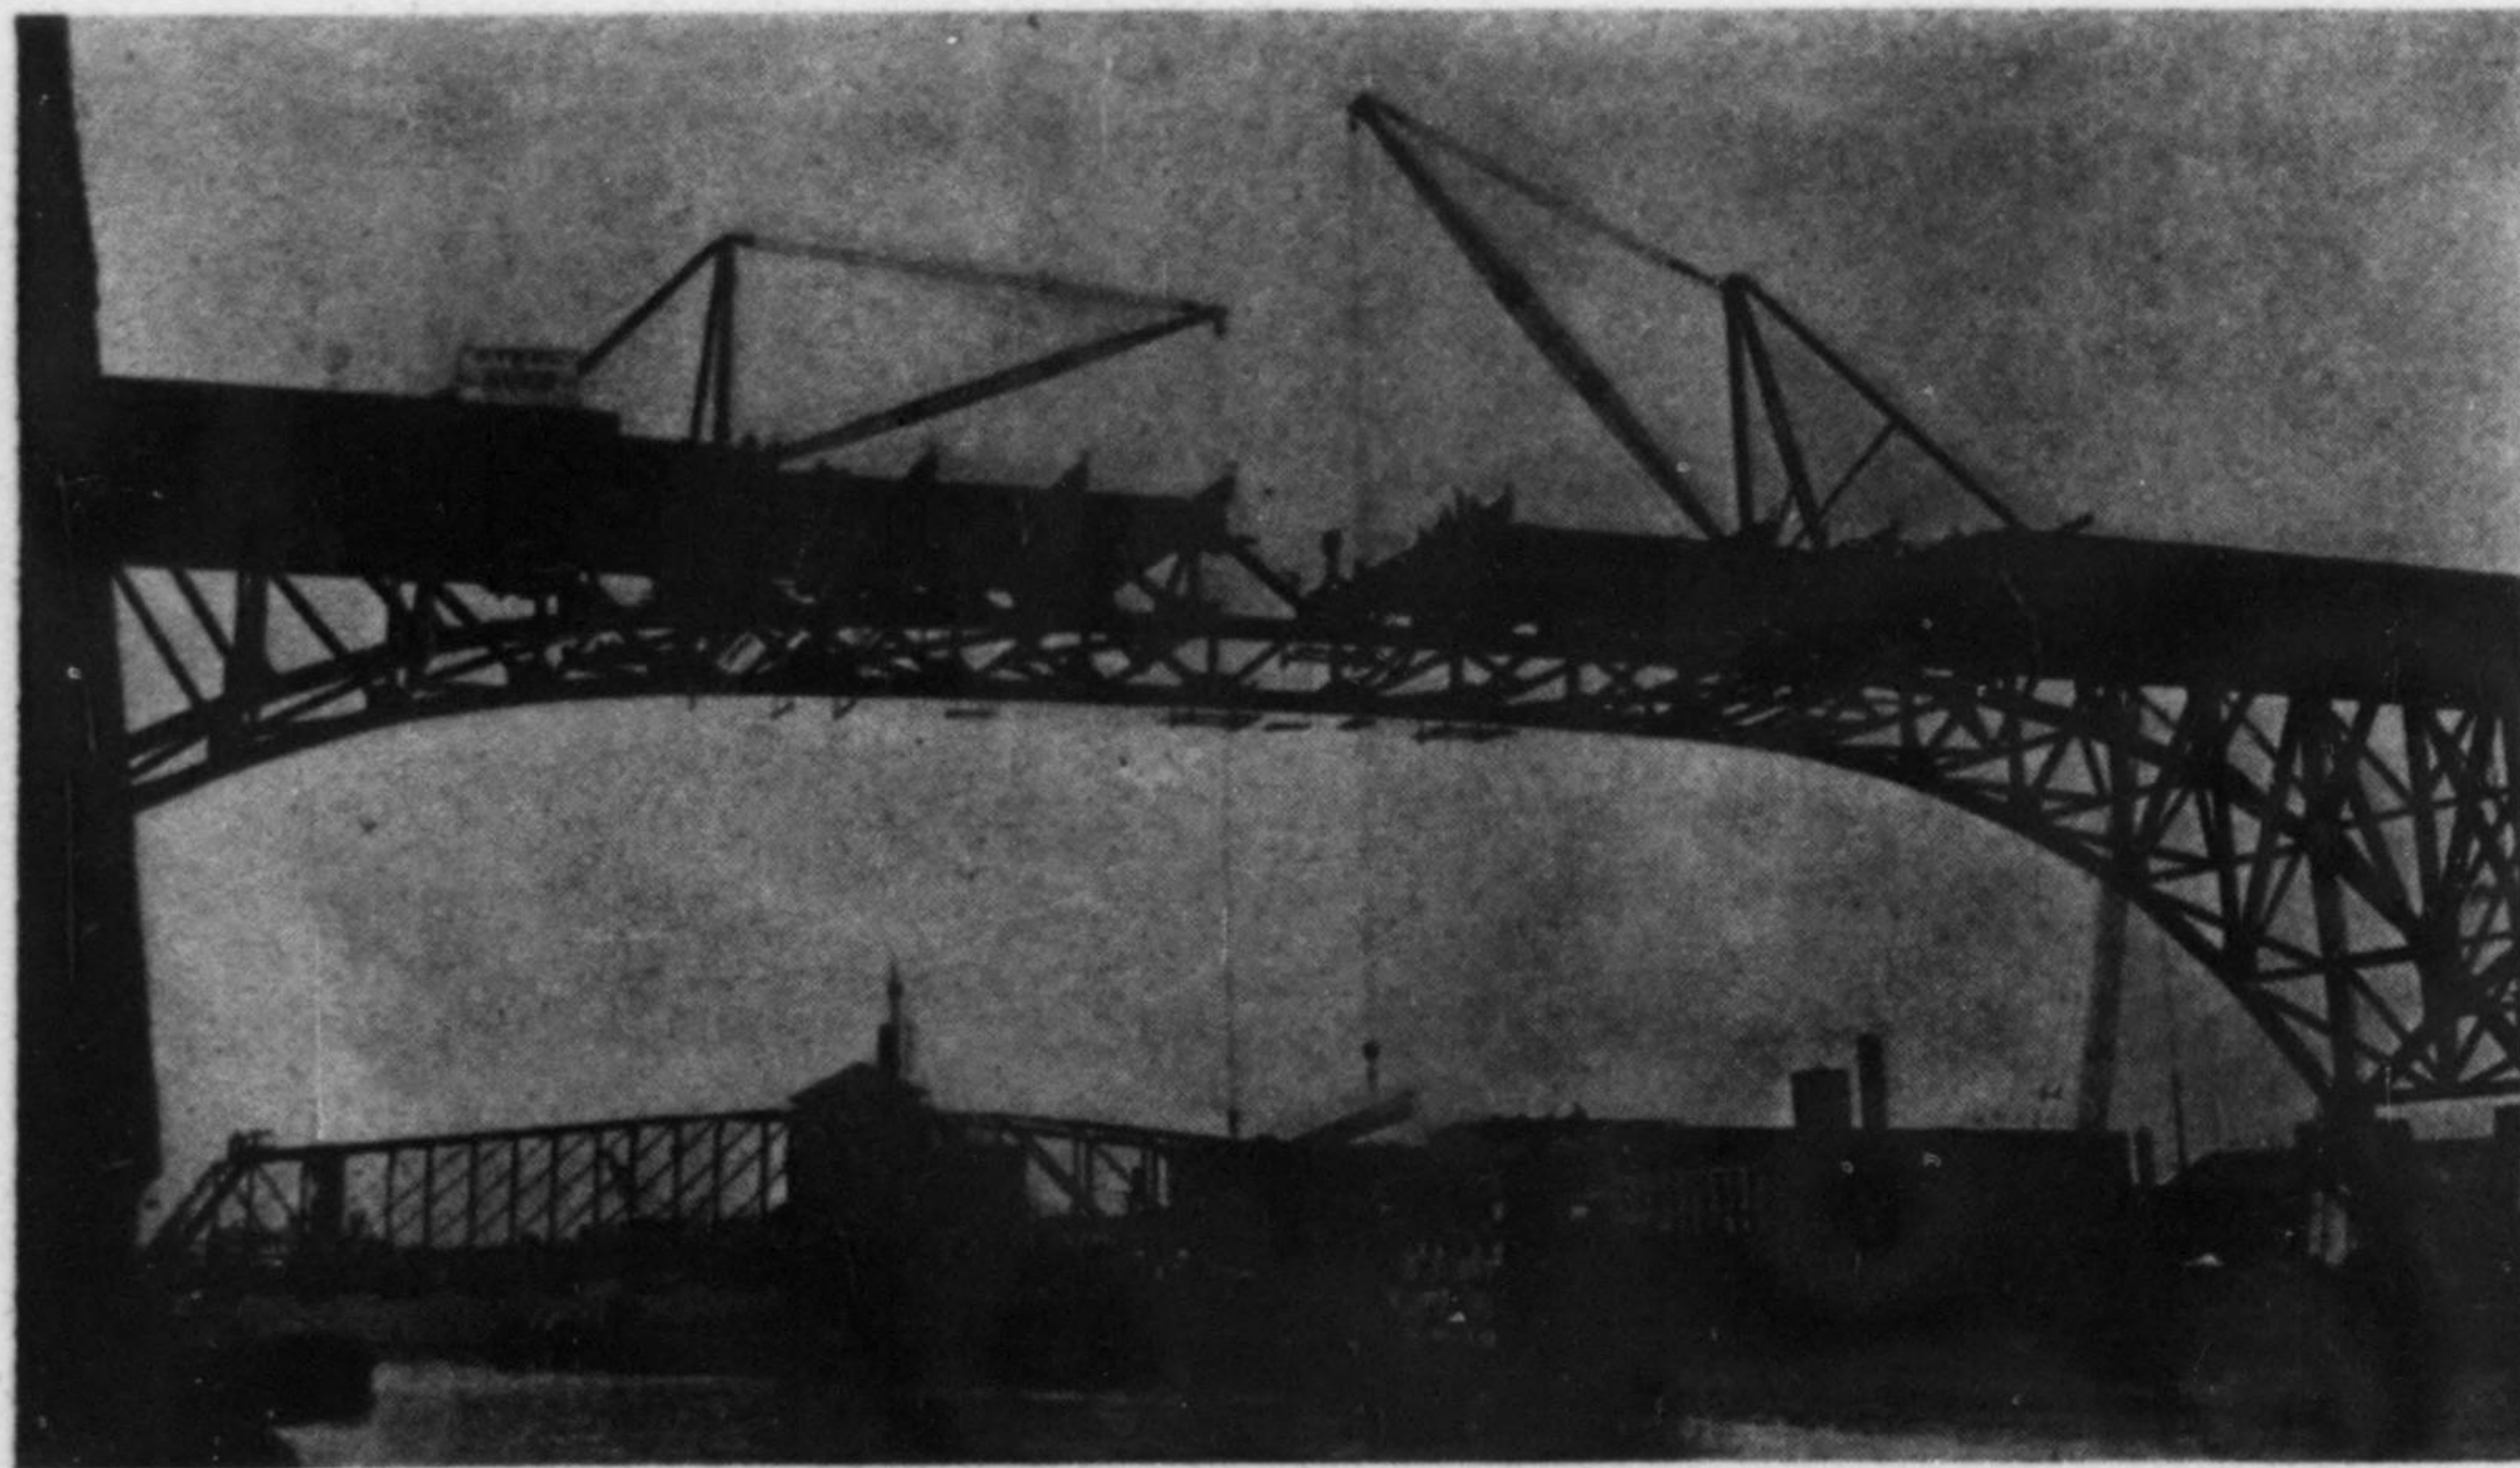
The 400-ft. span over the Cuyahoga River was erected by cantilevering, with derricks on the deck. Note old swing span, to be maintained for industrial area.
